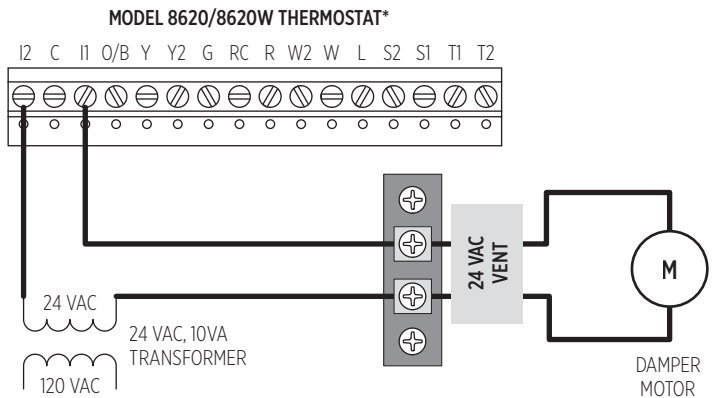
A – WIRING TO THERMOSTAT AND DAMPER
